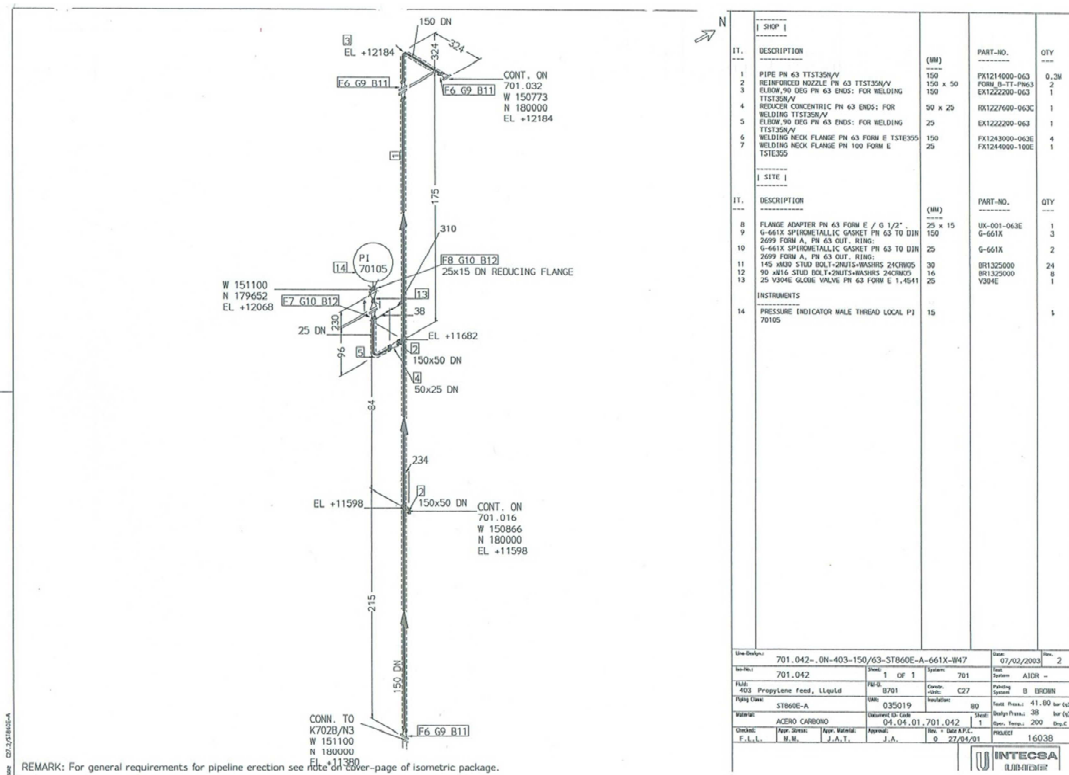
Isometric drawing of YS701-01/02 sheet 1.
